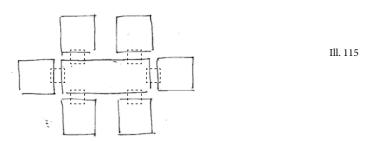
1/ immersion 2/ refuge 3/ bath 4/ floor
